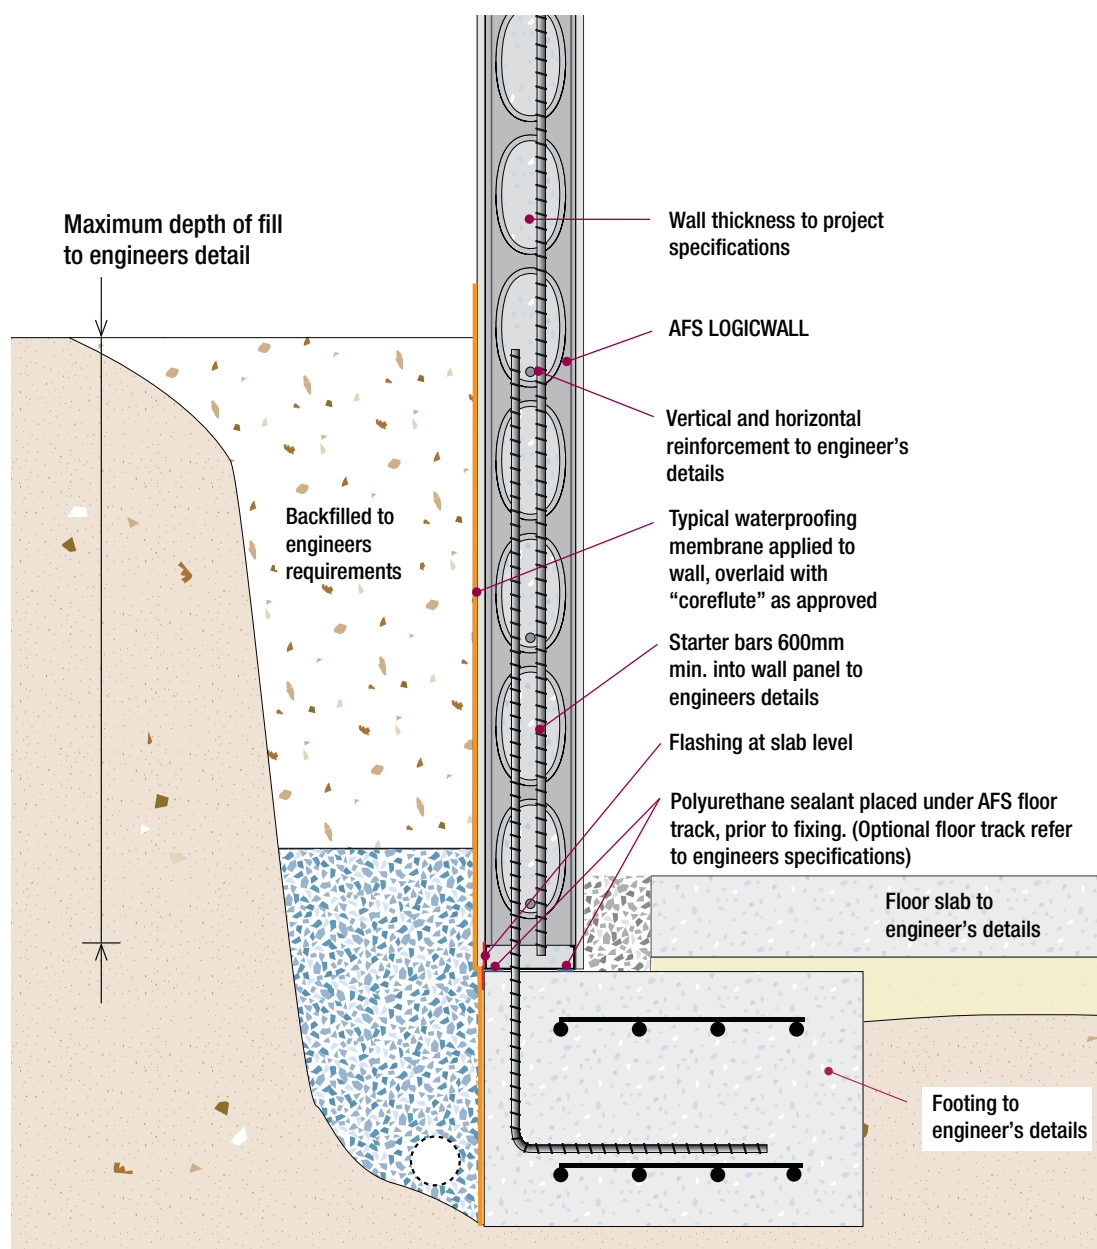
AFS Logicwall® Retaining Wall / Basement Wall Slab Junction
